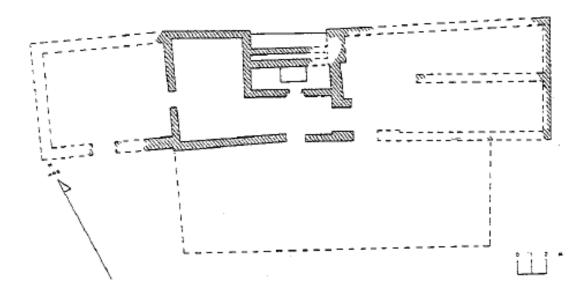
Structure 81, Full Scale Example of Multiroom Building Containing a Shrine
